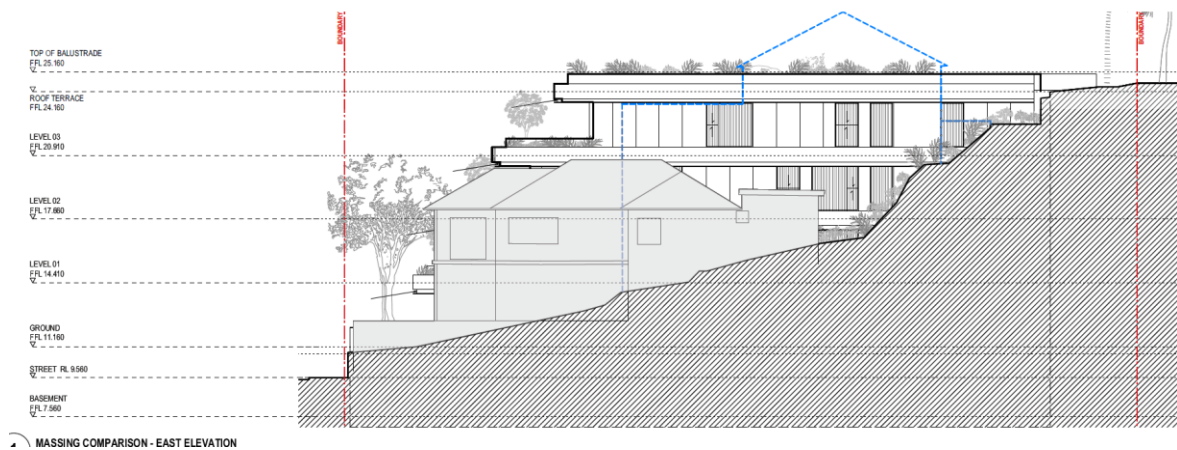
east elevation: existing, proposed and adjacent dwelling
